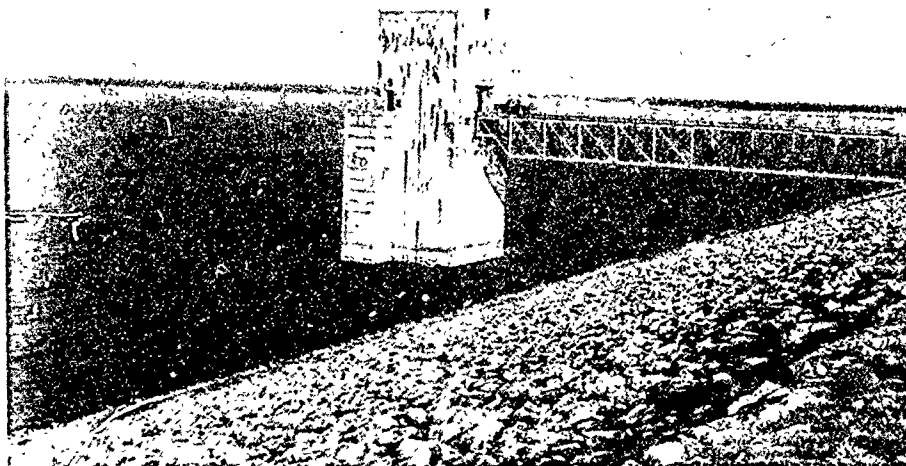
View of the outlet works tower and service bridge, Sep 83.
